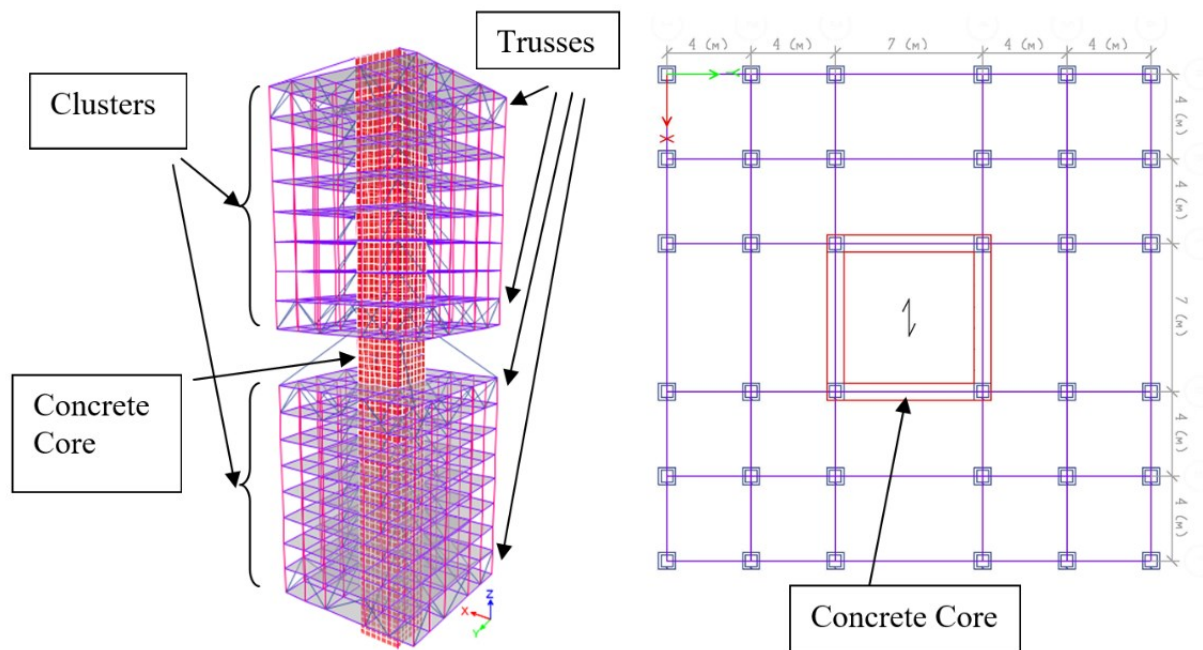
Three-dimensional view and plan of the suspended high-rise steel building without shear walls (SS1).
